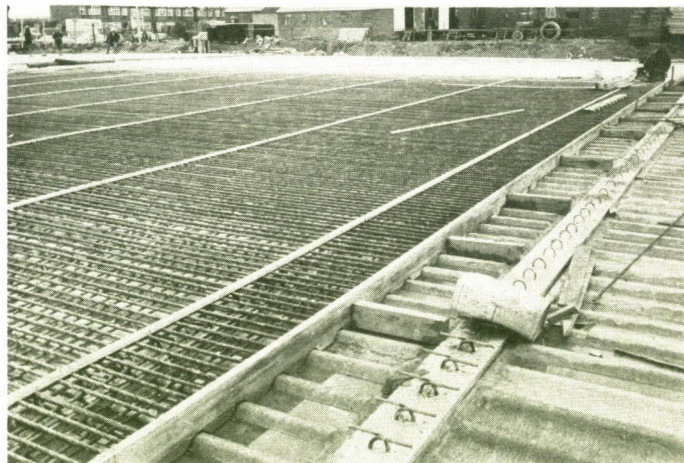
Reinforcement installed ready for pouring the concrete decking slab
